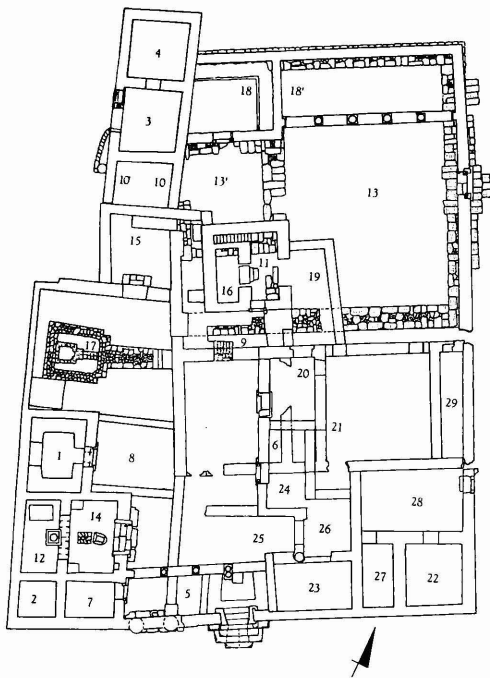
Actual state plan with foundation walls of period 1 highlighted. Drawn by T. Seymour.
